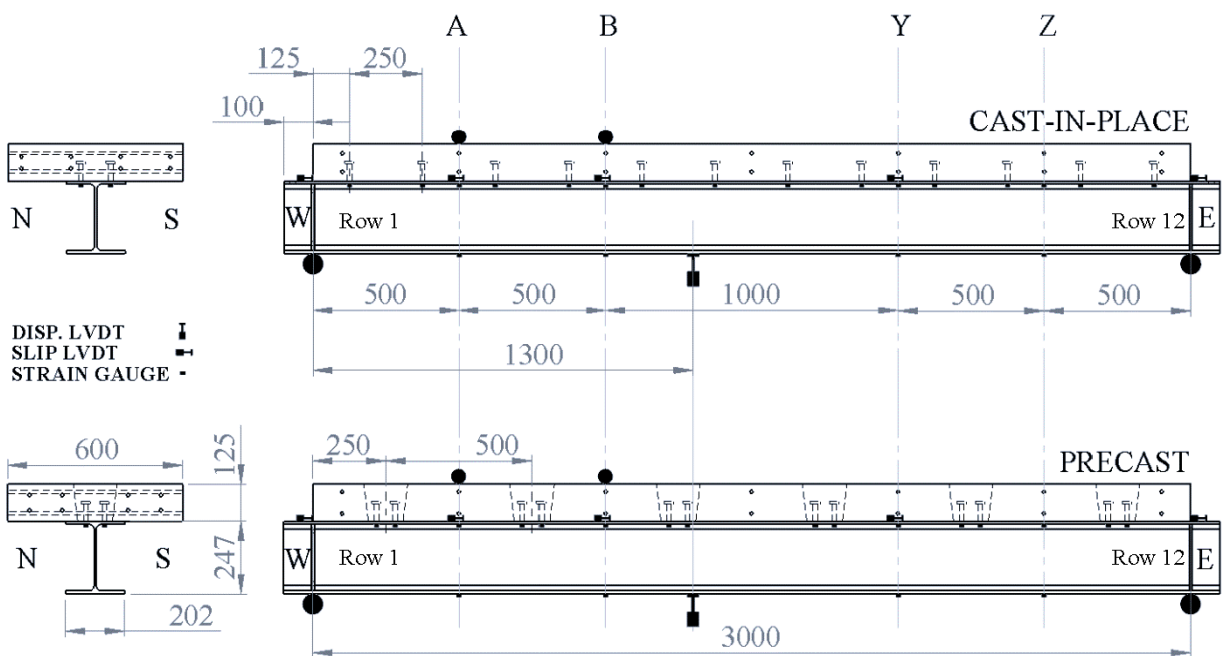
CS and PS beam specimen geometry and layout (dimensions in mm).
